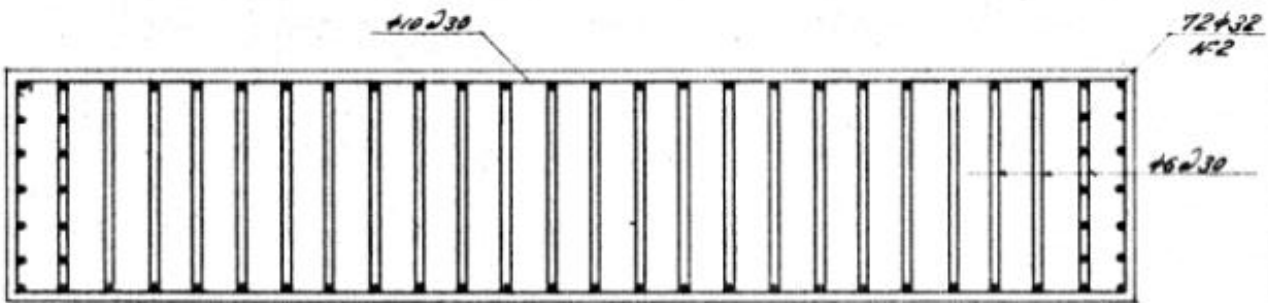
Reinforcing steel specified at the base of the Arch from the original drawings (Darr el Handasah Consulting Engineers, C317, Revision 2, 1969)
